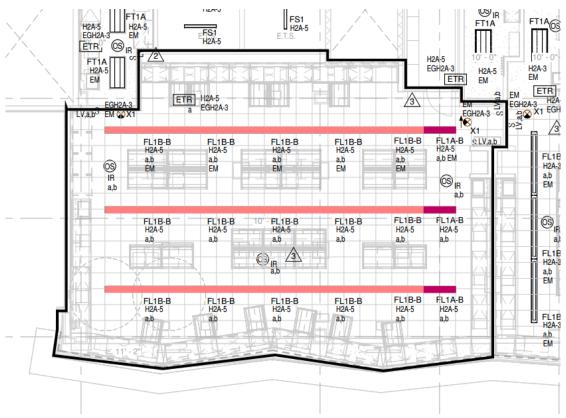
| Second Floor Lighting Plan Main DNA Lab
